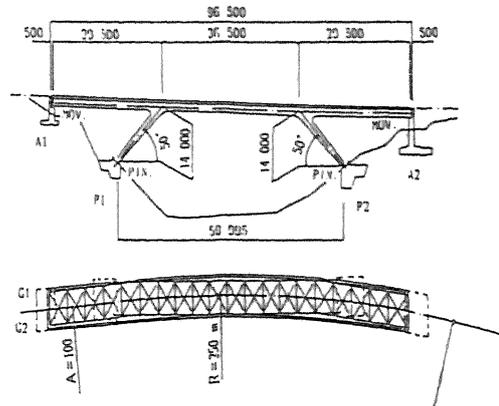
General view of strutted rigid-frame bridge with horizontally bent-angles
